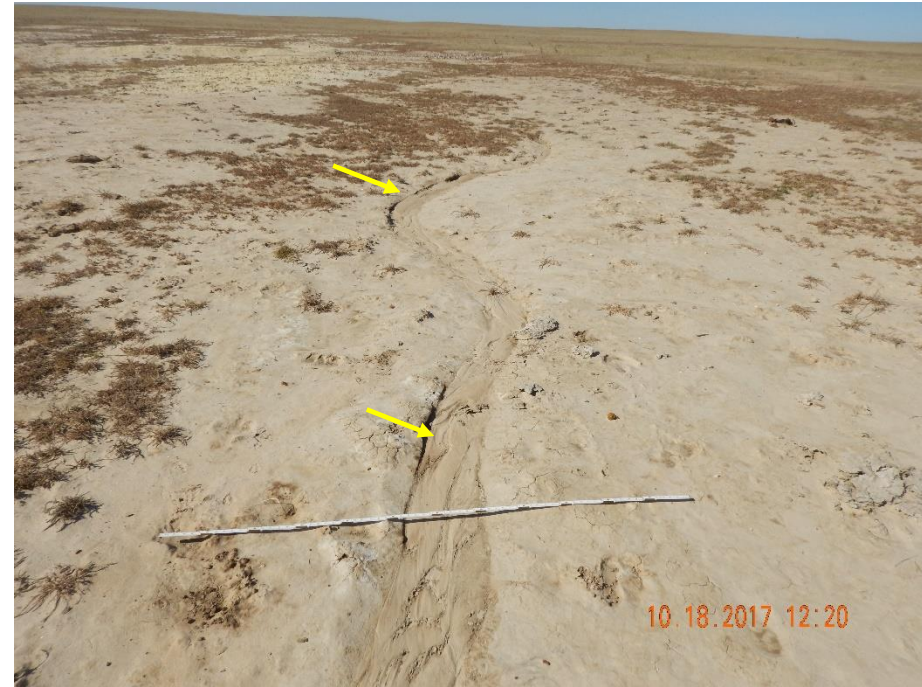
Photo taken from the southern end of the disturbance area, facing west. Photo shows water movement patterns, and stormwater erosion beginning to reform shallow gulleys and degrading the site. 6 foot measuring stick for reference
